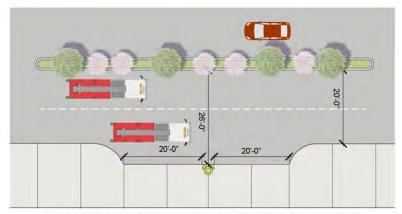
FIRE ACCESS UNOBSTRUCTED WIDTH OF 26 FT ADJACENT TO FIRE HYDRANT
